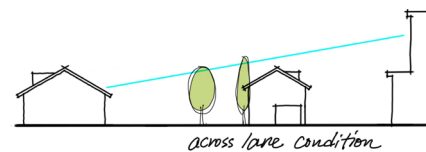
If a proposed building would be taller than adjacent development, upper floors should step back to provide transition in scale.
